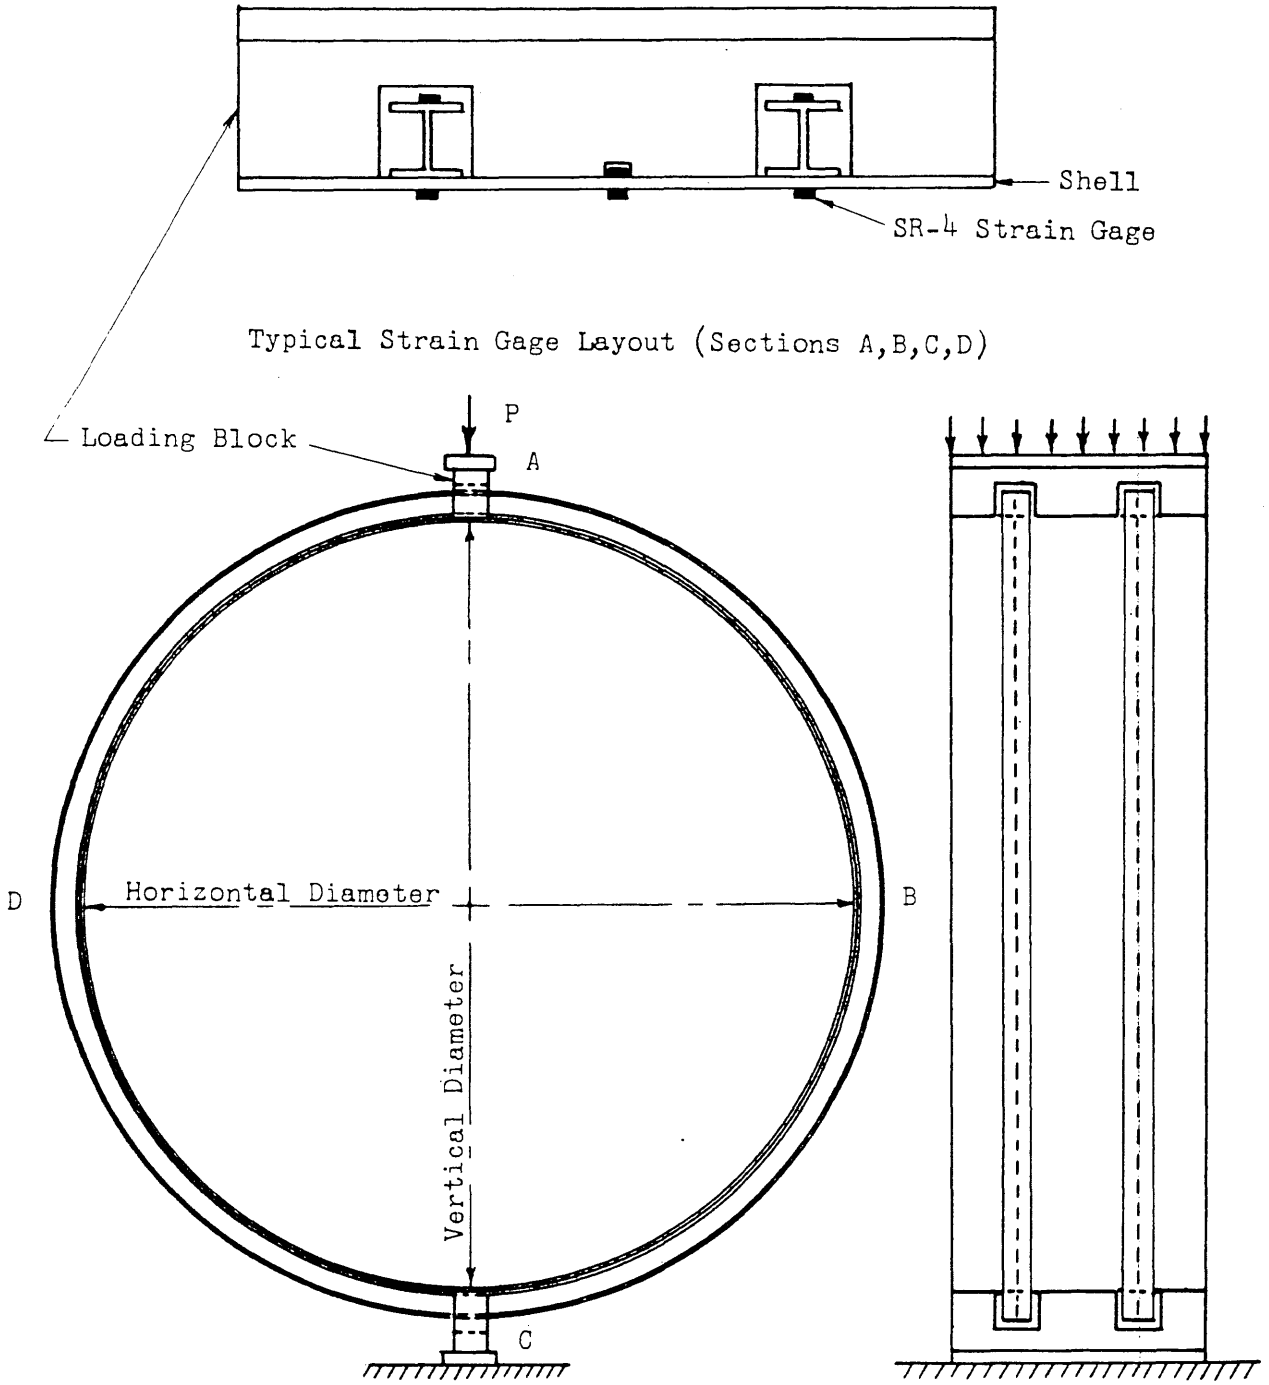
SCHEMATIC VIEW OF ARRANGEMENT FOR FULL RING TESTS
